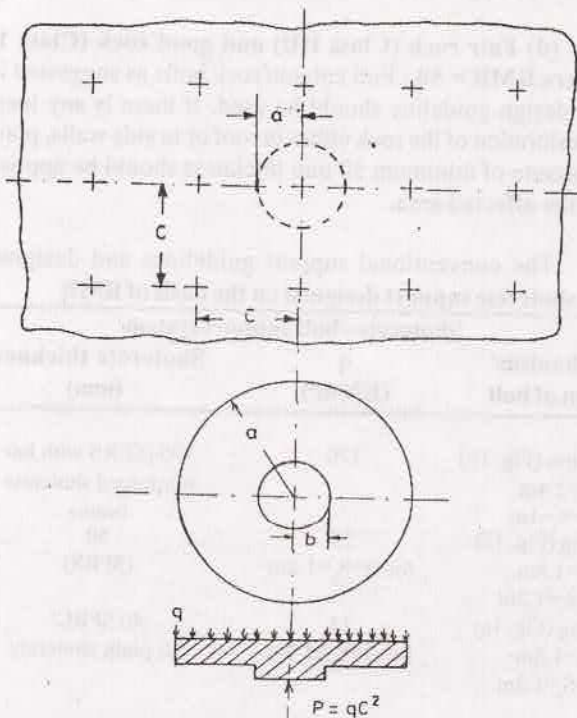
A model of shotcrete layer supported at many equidistant points by rock bolts.
